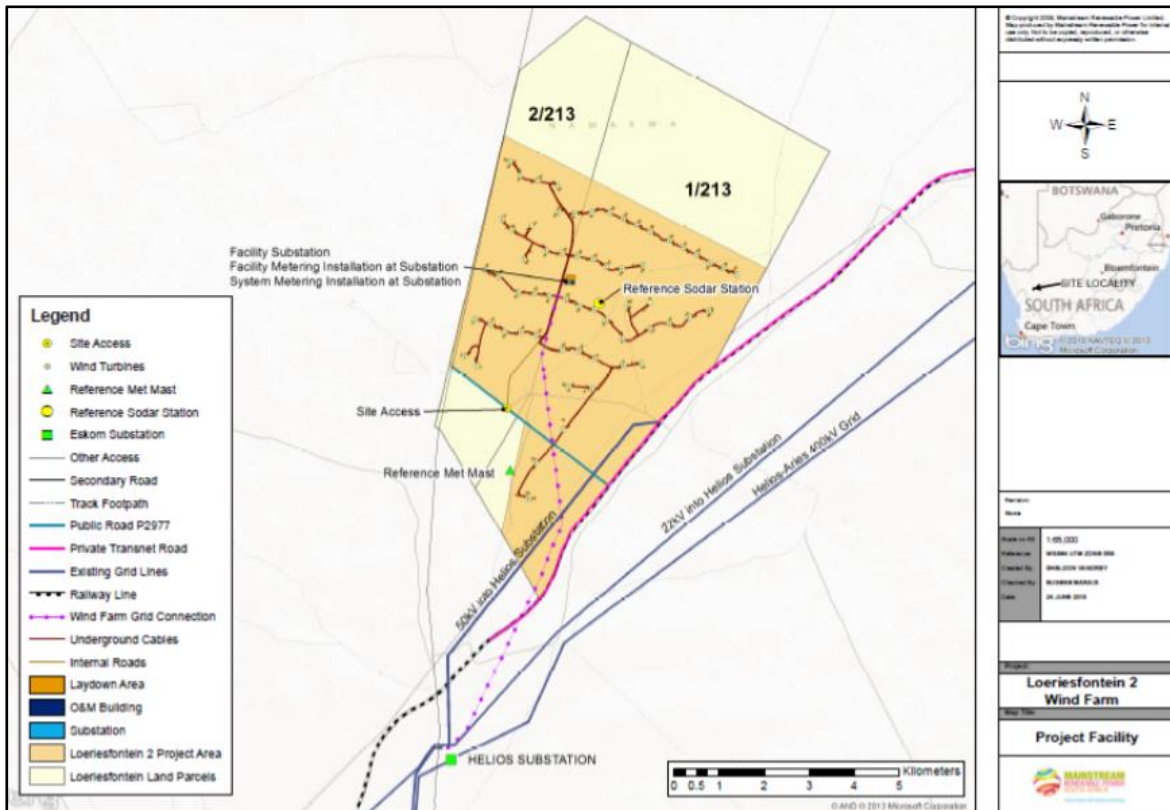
Mainstream Loeriesfontein 2 WEF layout plan which is one of the wind farms under construction adjacent to which Alternative C would be routed. (source: Mainstream, 2013)
